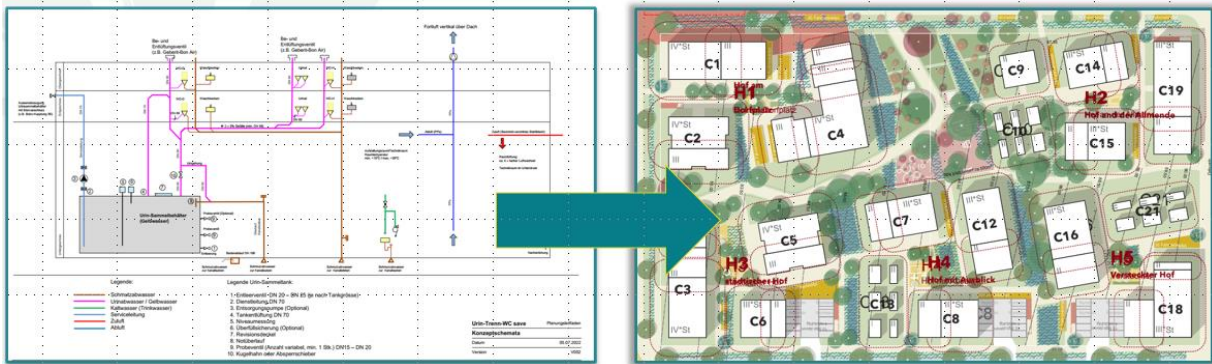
Upscaling approach of evh from building scale to neighborhood scale on their 2 ha premises hosting 15 houses and 350 tenants.
